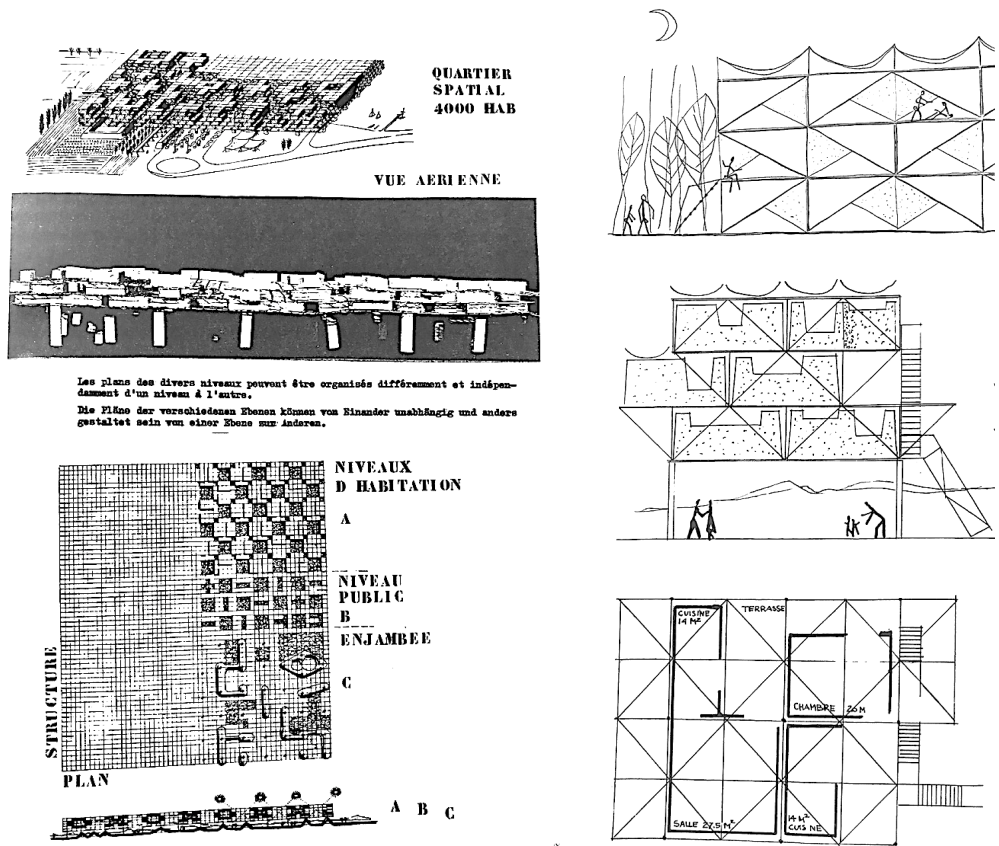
Site plan, floor plan, and sections for Ville Spatiale. Reprinted from Friedman & Orazi (2015)
